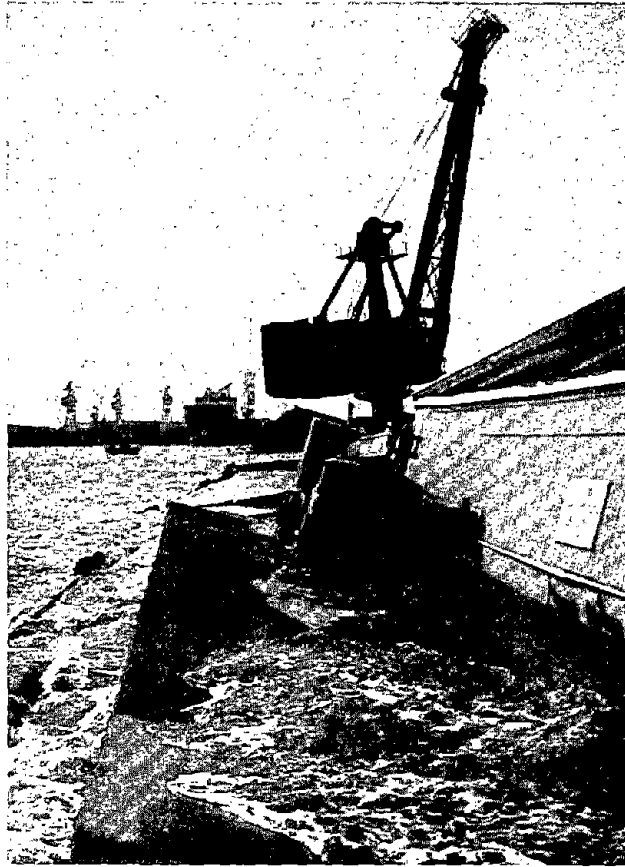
Damage to the end of Hyogo Pier No. 2.
